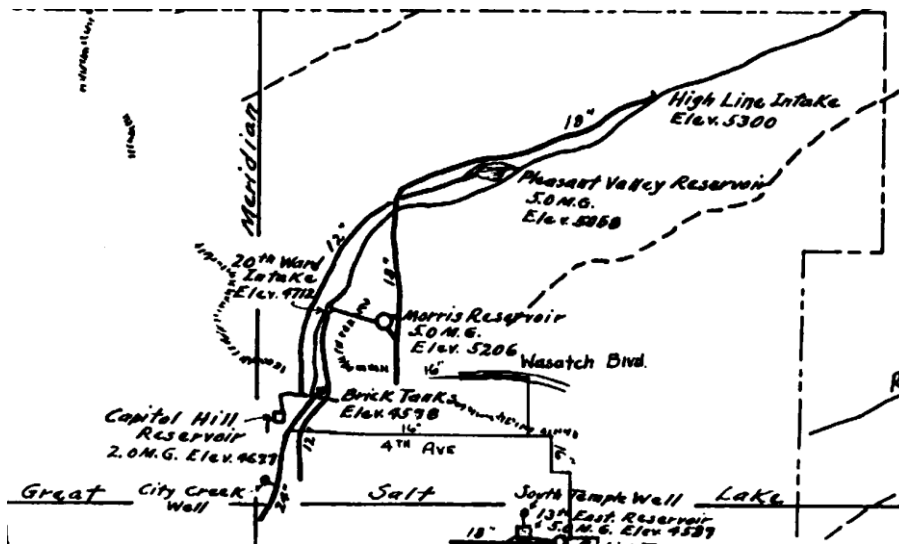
Location of Brick Tank House at Elevation 4,598 feet per Hooton (1986).
